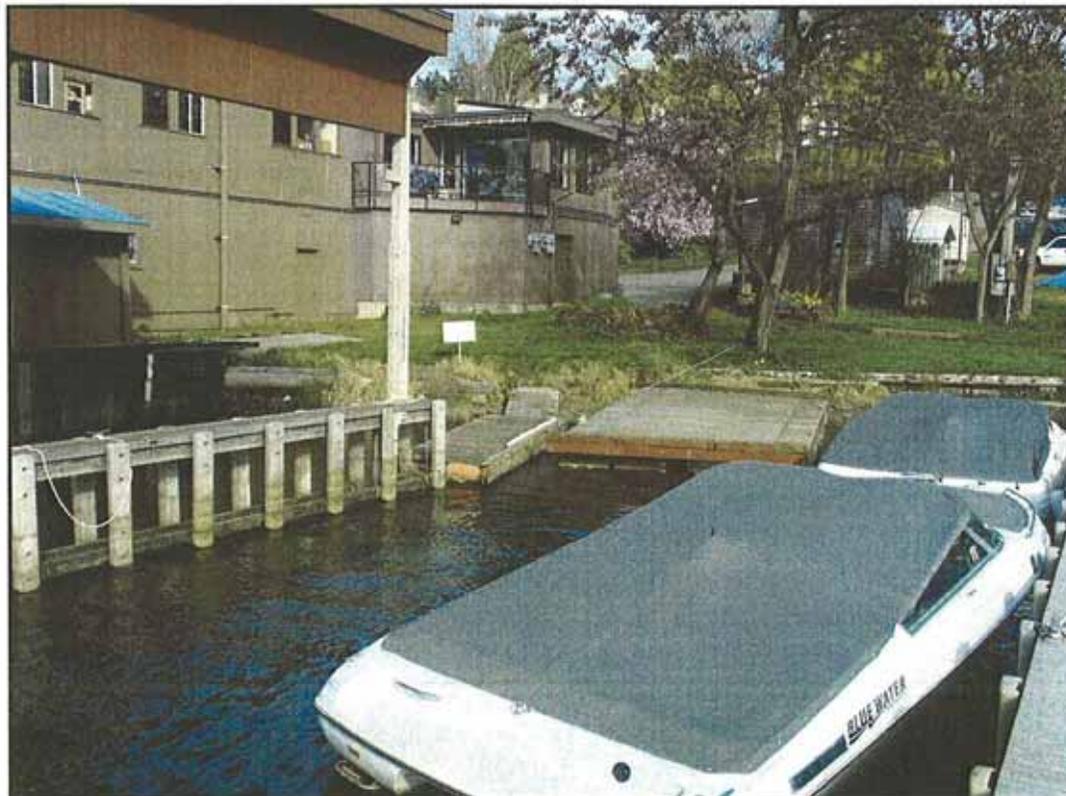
View of Pier G2 (left) and three nearshore floats facing northeast from Pier H.
